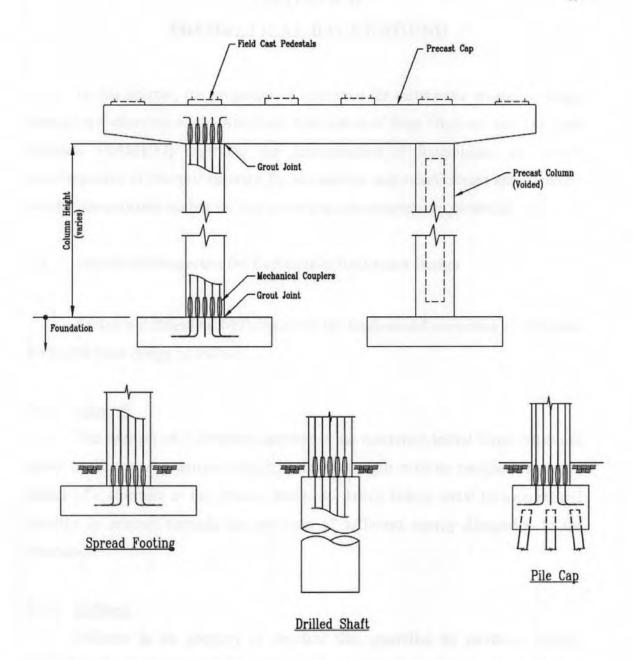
Precast bridge system: precast bent assembly and foundation types
